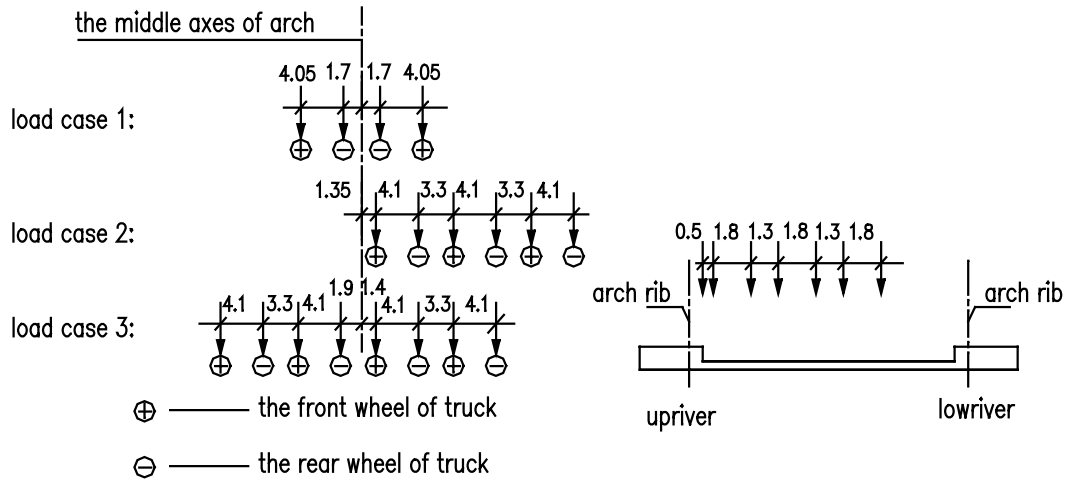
Test arrangement of Qunyi Bridge (unit: cm)
